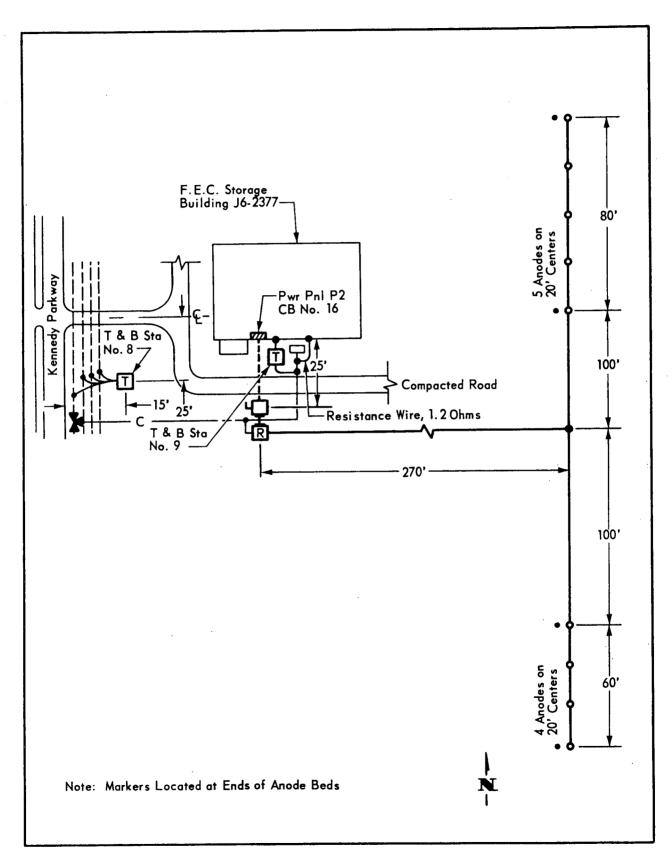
Site No. 2 and Test and Bond Station Nos. 8 and 9
